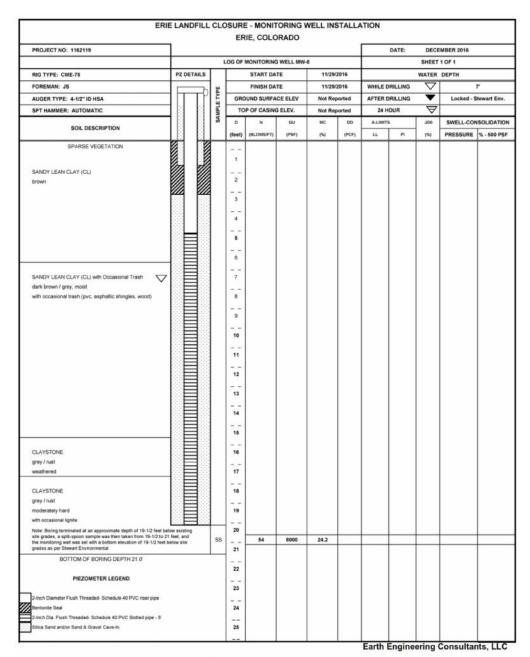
Earth Engineering Test Boring SEC MW-6
